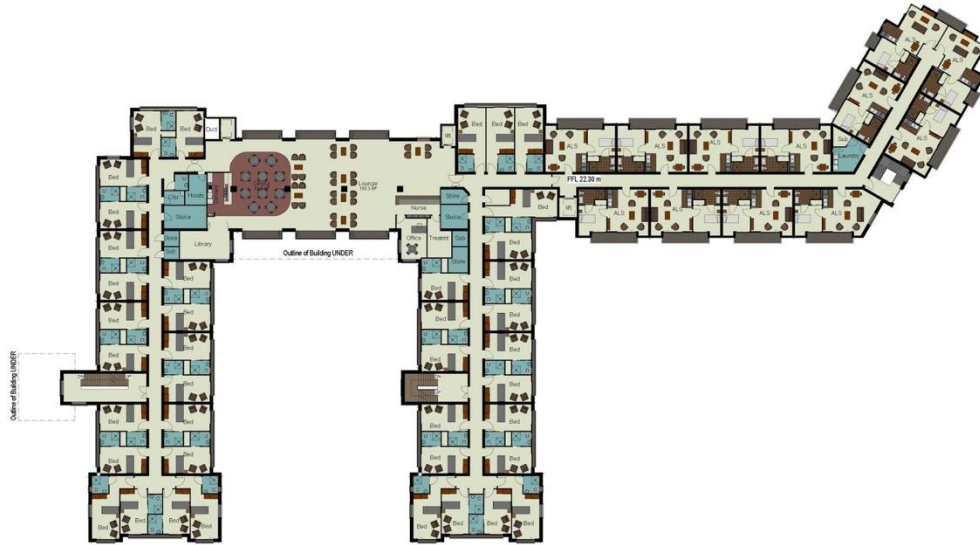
The Level 4 floor plan of Building B01 (Ryman Drawing A1-030 RC15).
